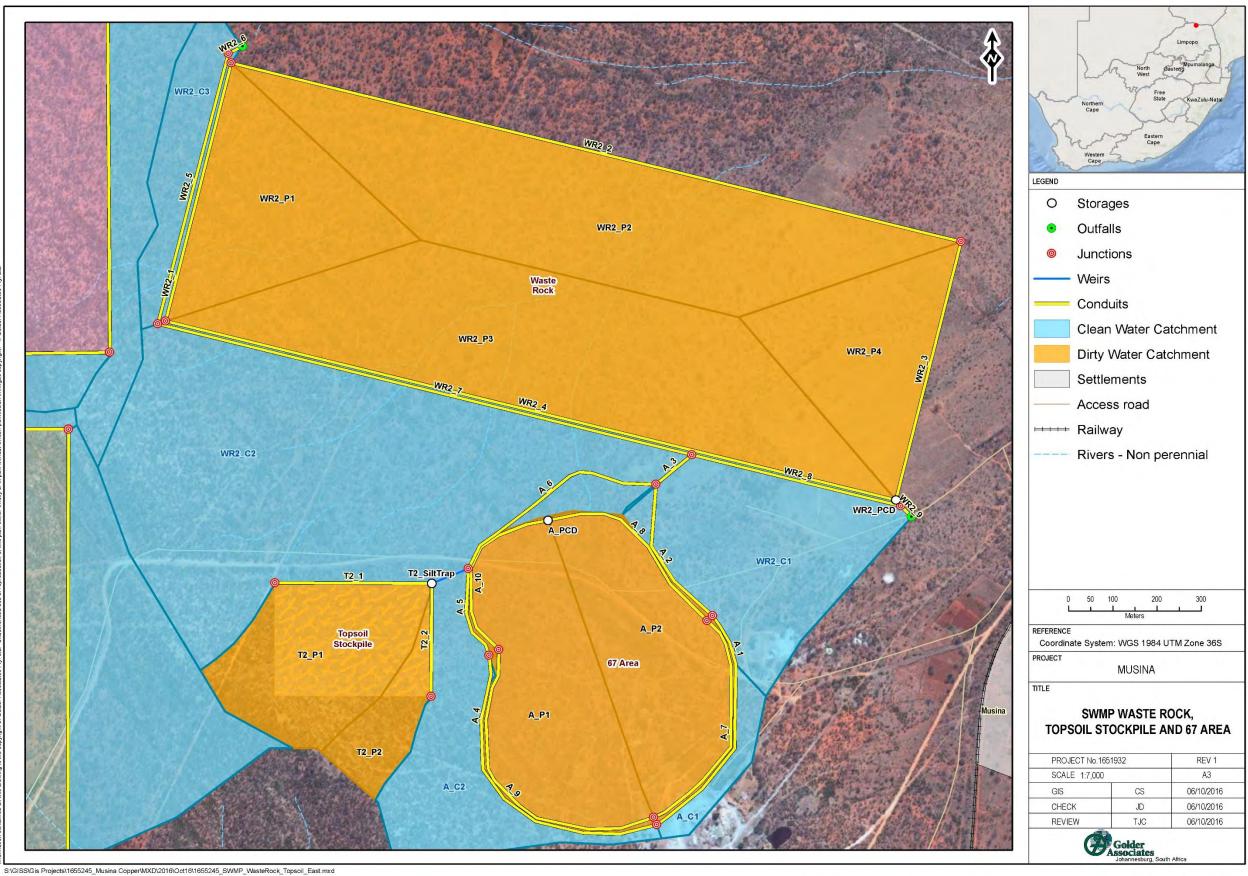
Eastern Waste Rock and topsoil stockpile stormwater management plan
